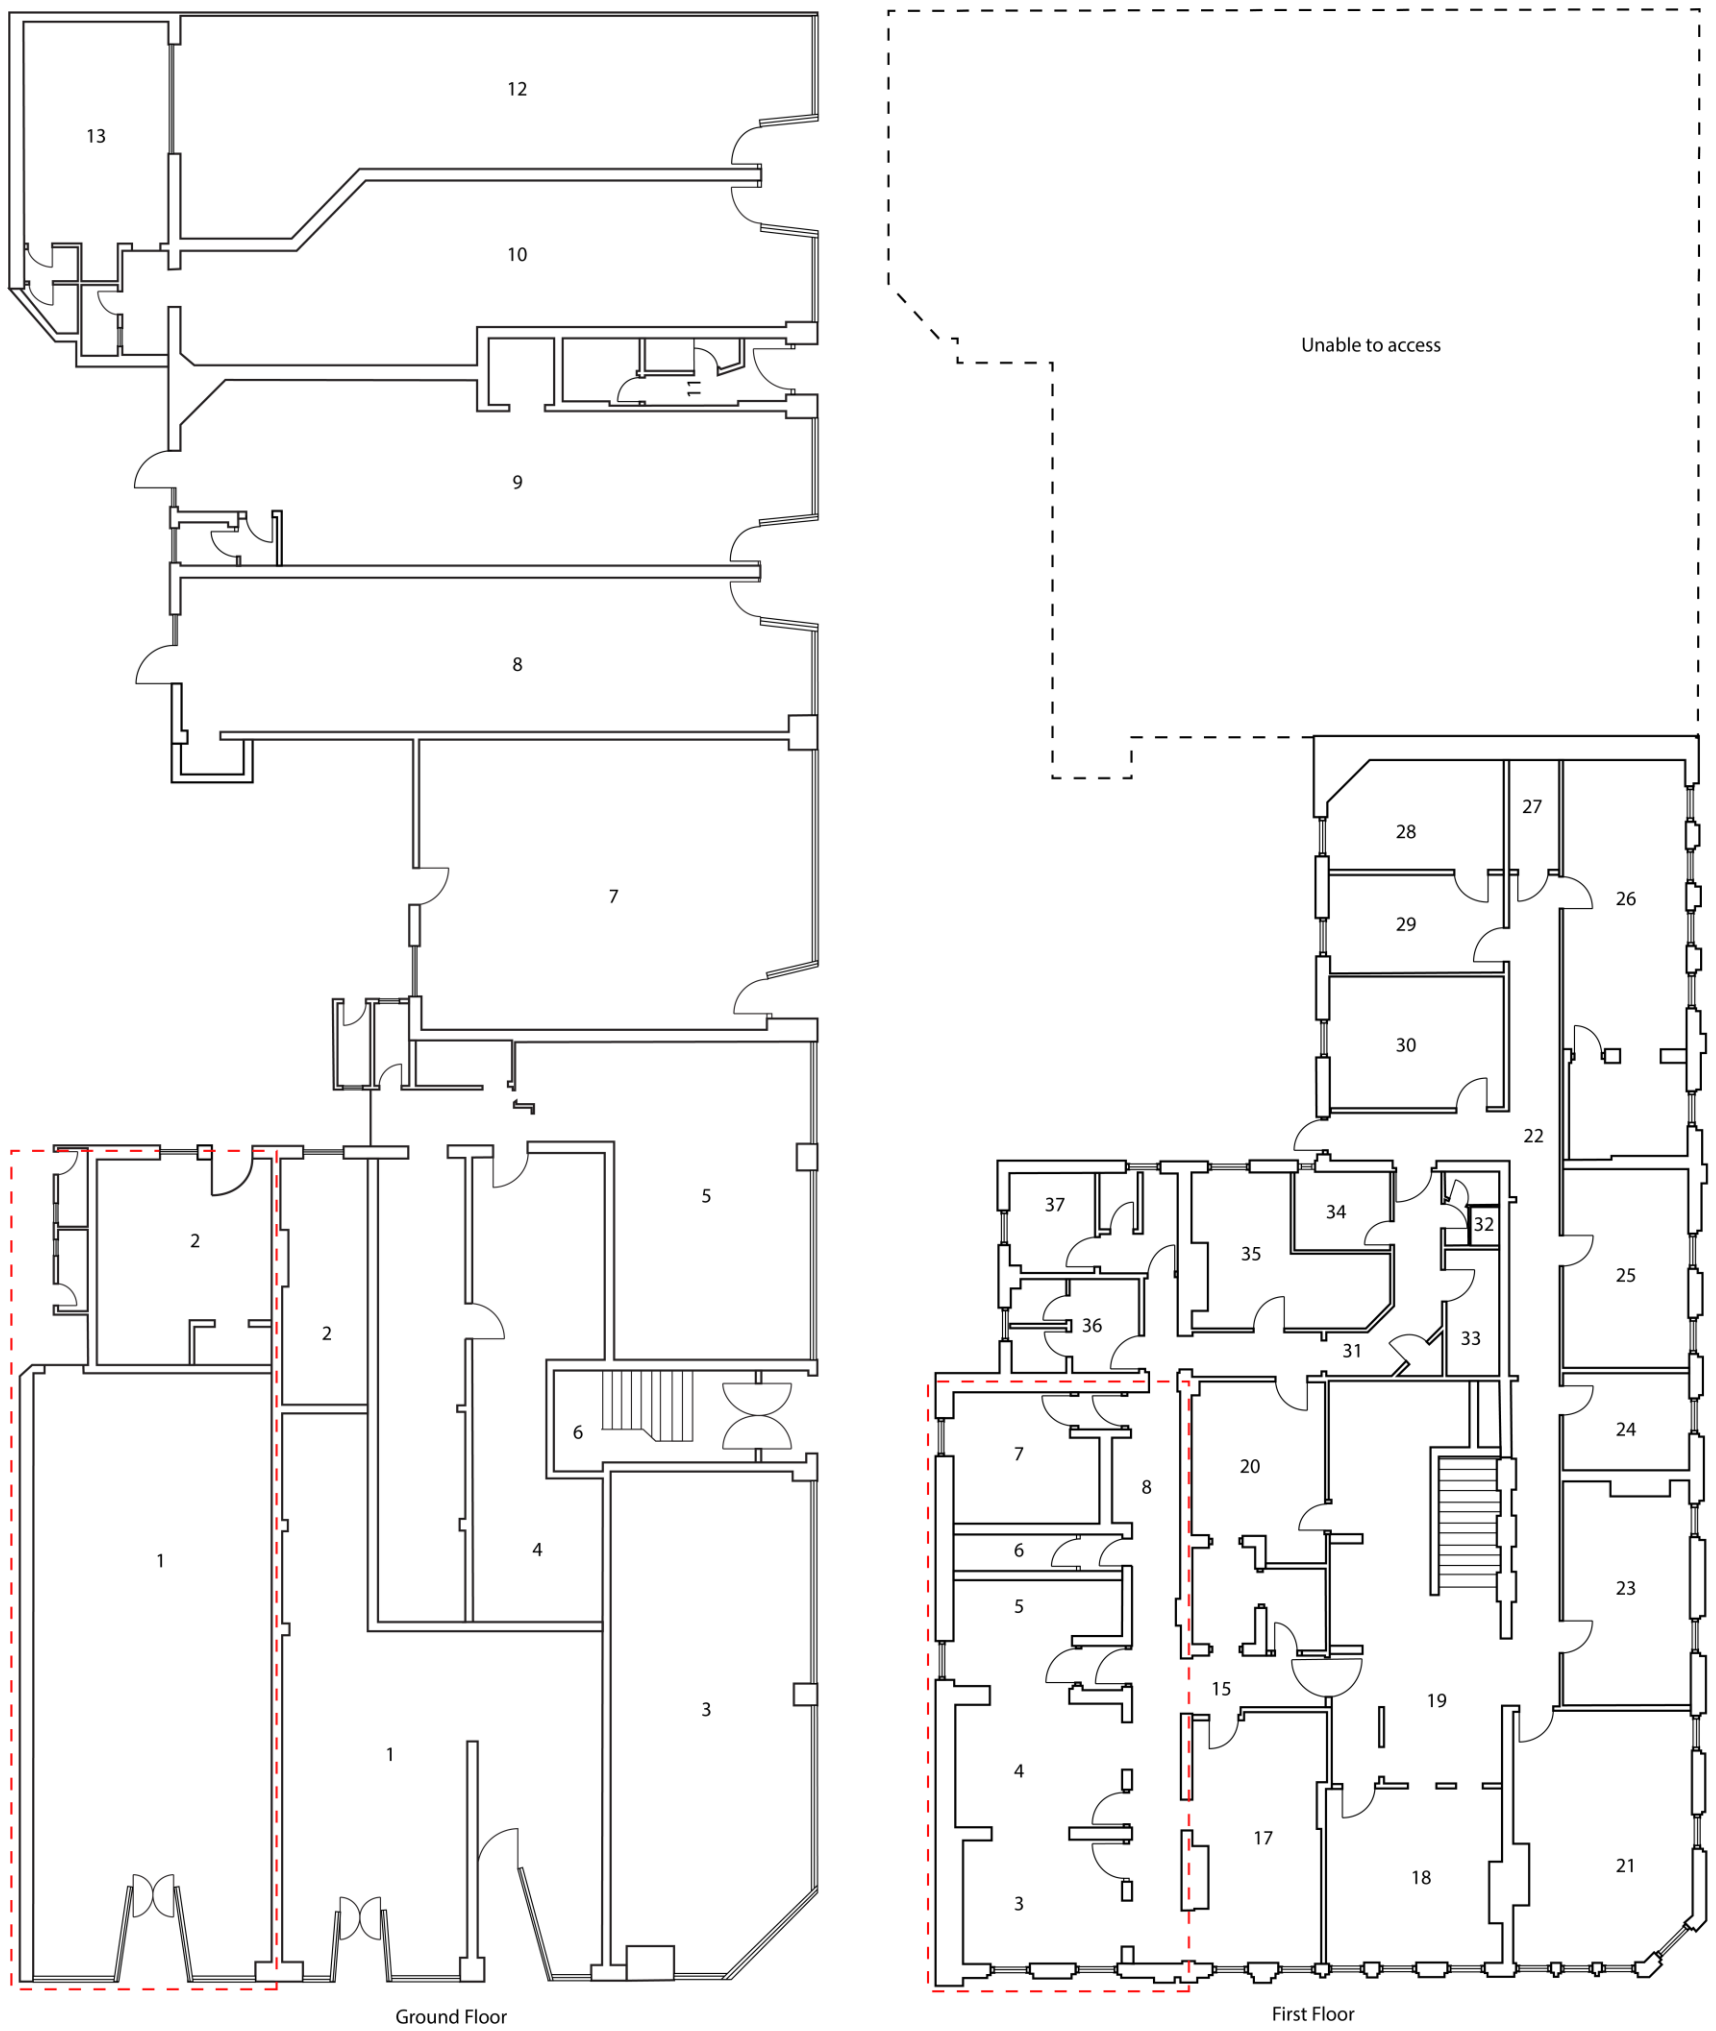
Ground and first floor plans of Fairweather's Building (outlined in red) and the Hotel Cecil.
